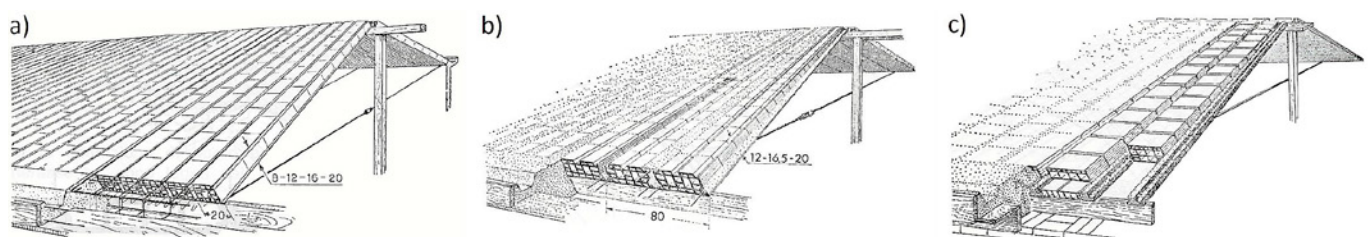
Eliminated thrust truss system: (a) SAP[®] trusses; (b) BISAP[®] trusses and (c) CELERSAP[®] trusses. Source: [8].
